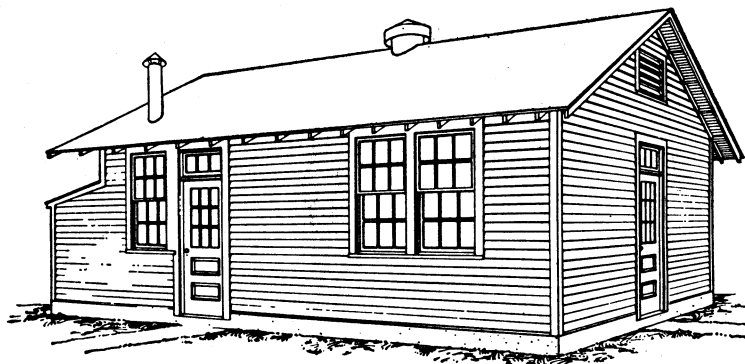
An arrangement for a 30 to 60 cow dairy where the milk is bottled. The building is 18 by 26 feet and contains three rooms besides a cold-storage room and machine room. Perspective view shows rear and right side of plan. Design No. 633
